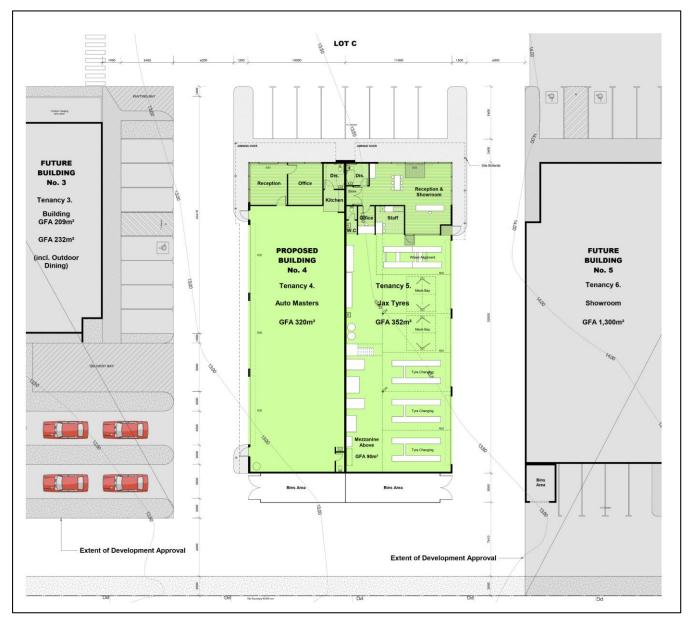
Floor Plan (Source: Meyer Shircore Architects)
